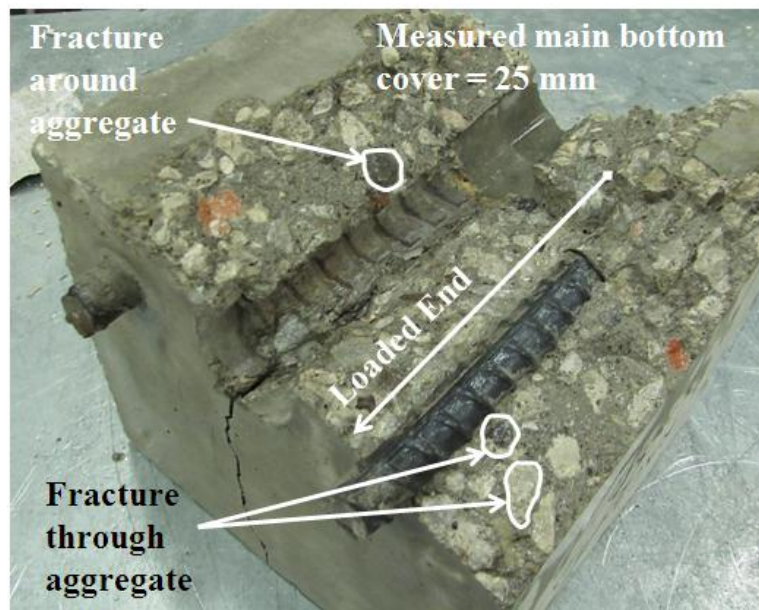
Main failure planes through concrete cover (dissected BE-RAC3-40-125B)
